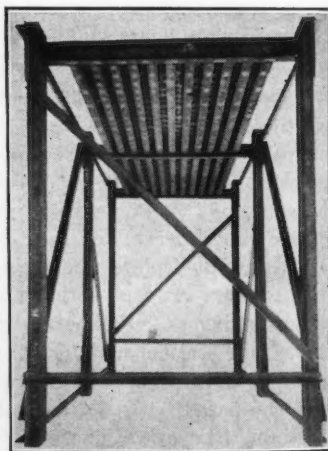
BOTTOM VIEW OF SECOND FLOOR MODEL
